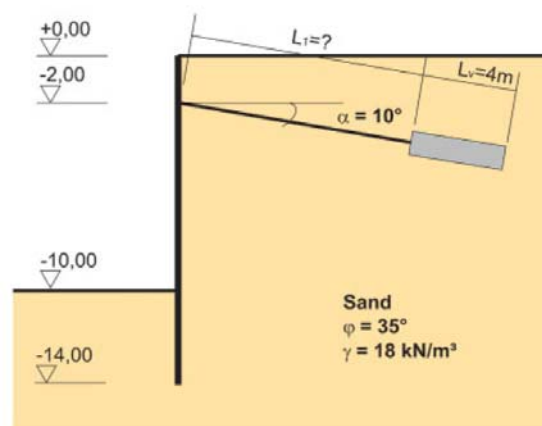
Geometry for a single anchored sheet pile wall [18]
